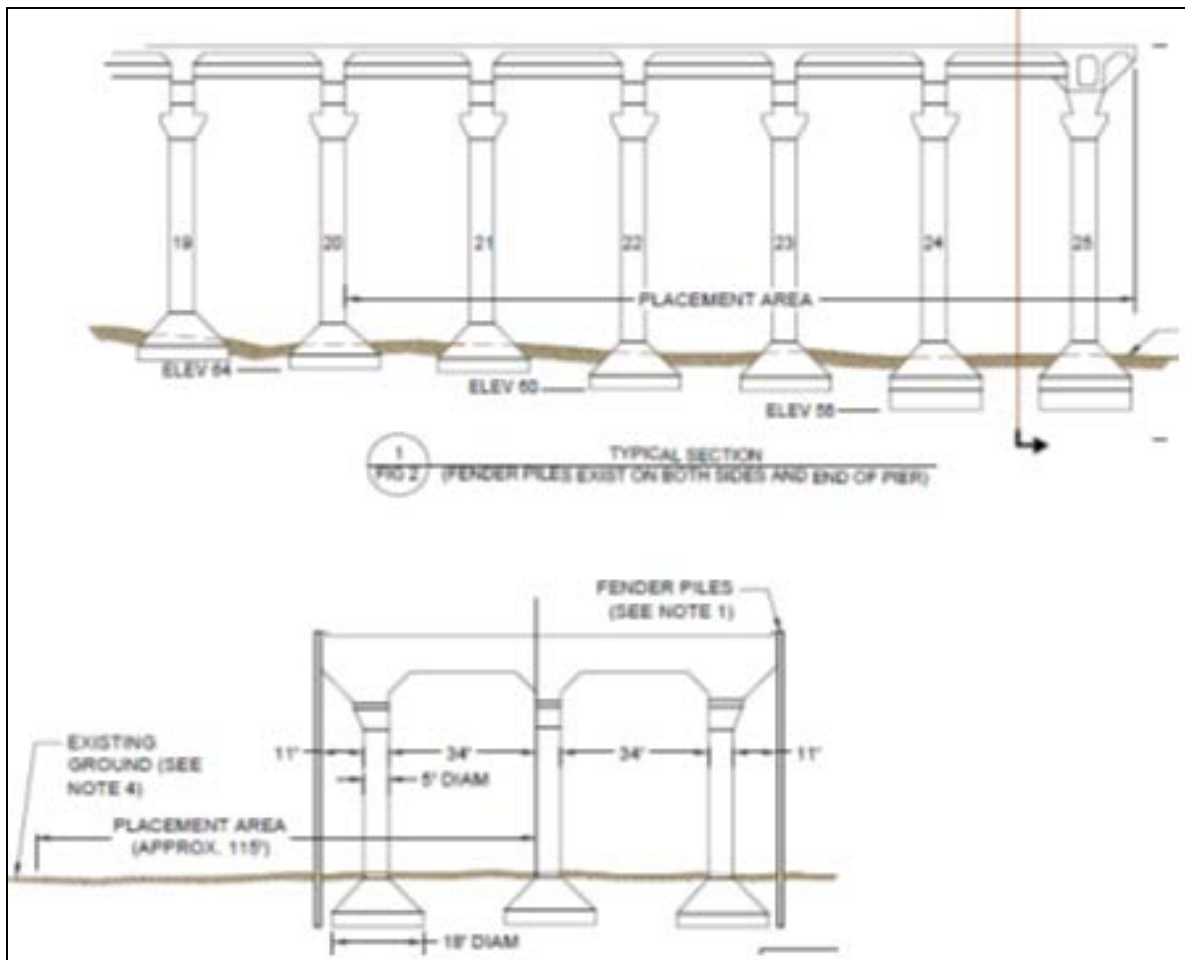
Cross Section of Target Amendment Area at Pier 7.
